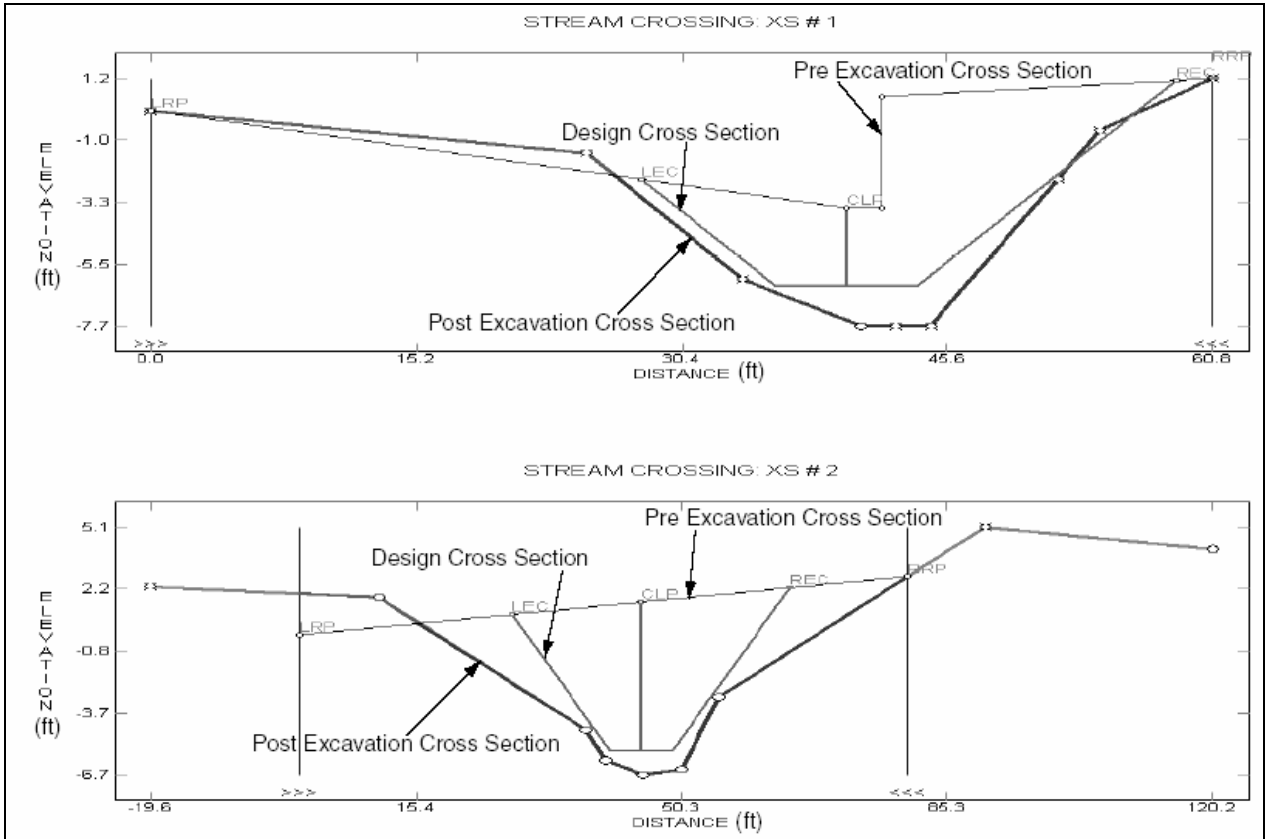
Redwood Creek 1300 Road Site #12 – Stream Crossing Pre & Post Excavation Cross Sections.
